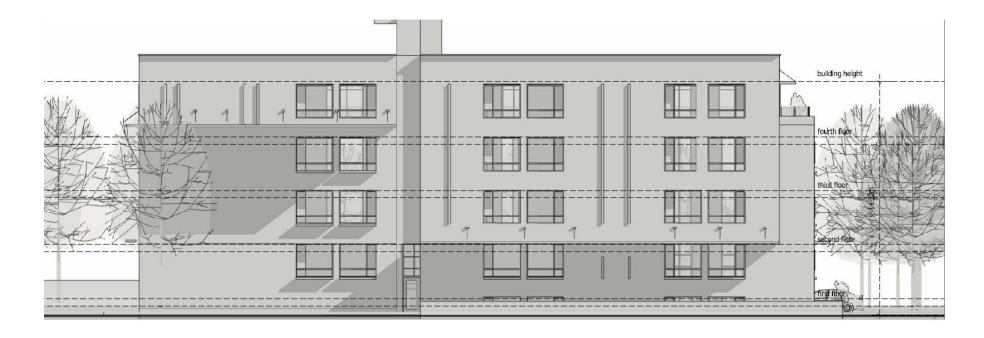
Proposed Building Elevation – North Elevation (unPoised Architecture Inc., October 13, 2021)
